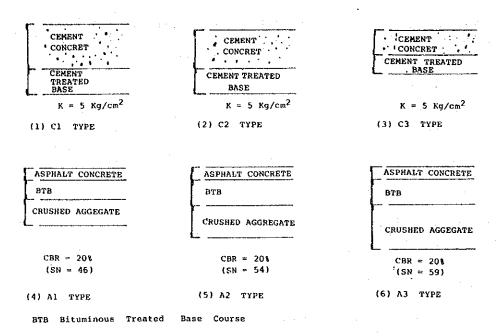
PROPOSED PAVEMENT STRUCTURE
